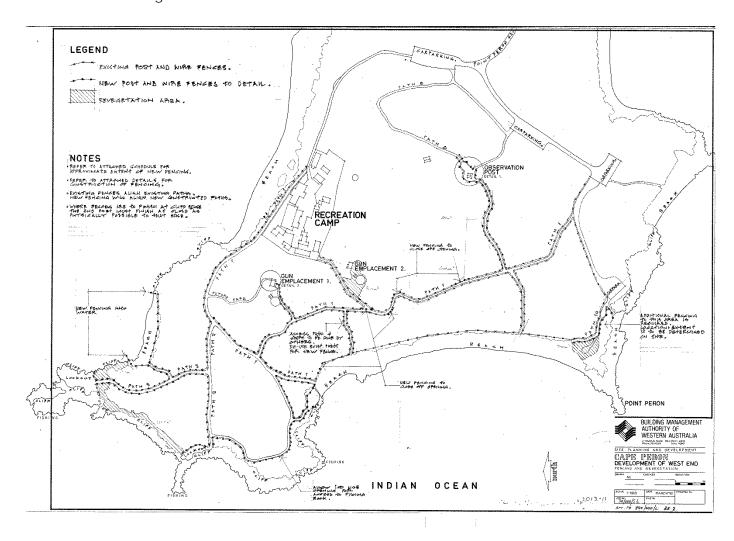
Site plan showing layout of new pathways, March 1992 Courtesy Building Management and Works
